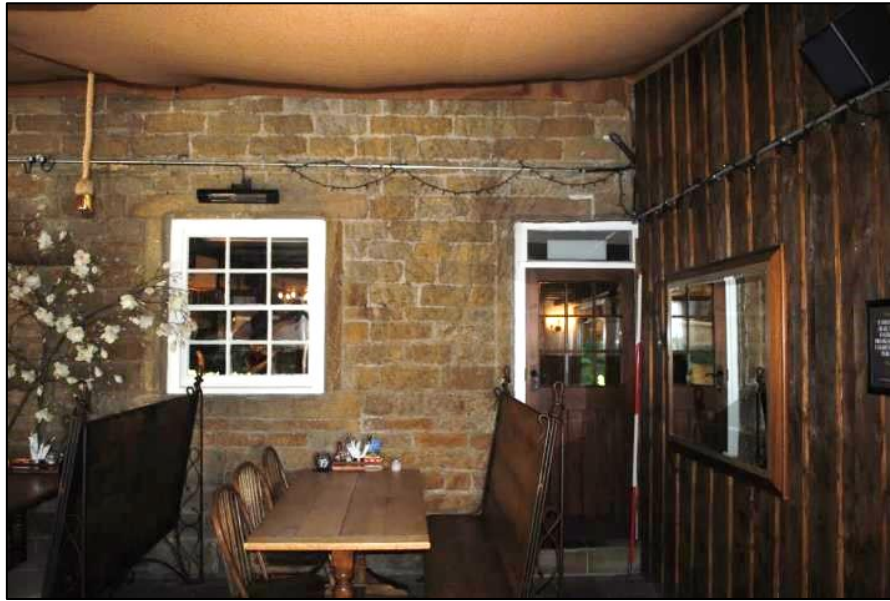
Later doorway (on the right) and an original window location (on the left); view N
